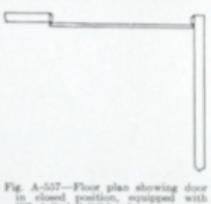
Floor plan showing door in closed position equipped with "SlydaSyde" CC hardware.
